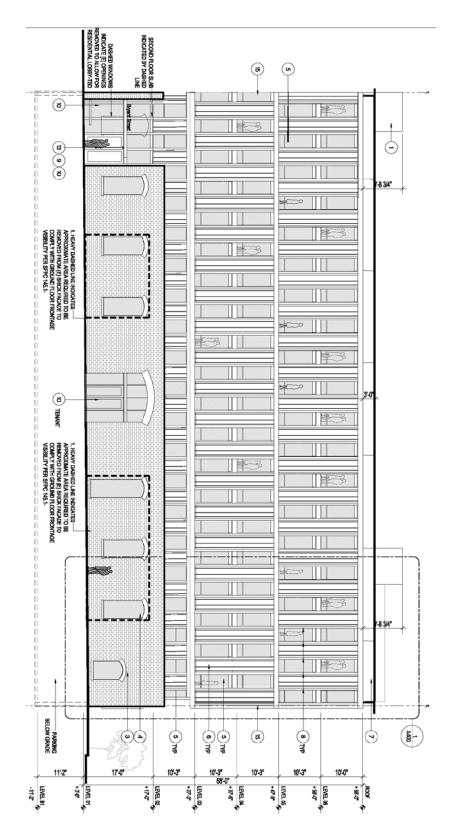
PROPOSED WEST ELEVATION (BRYANT STREET)
